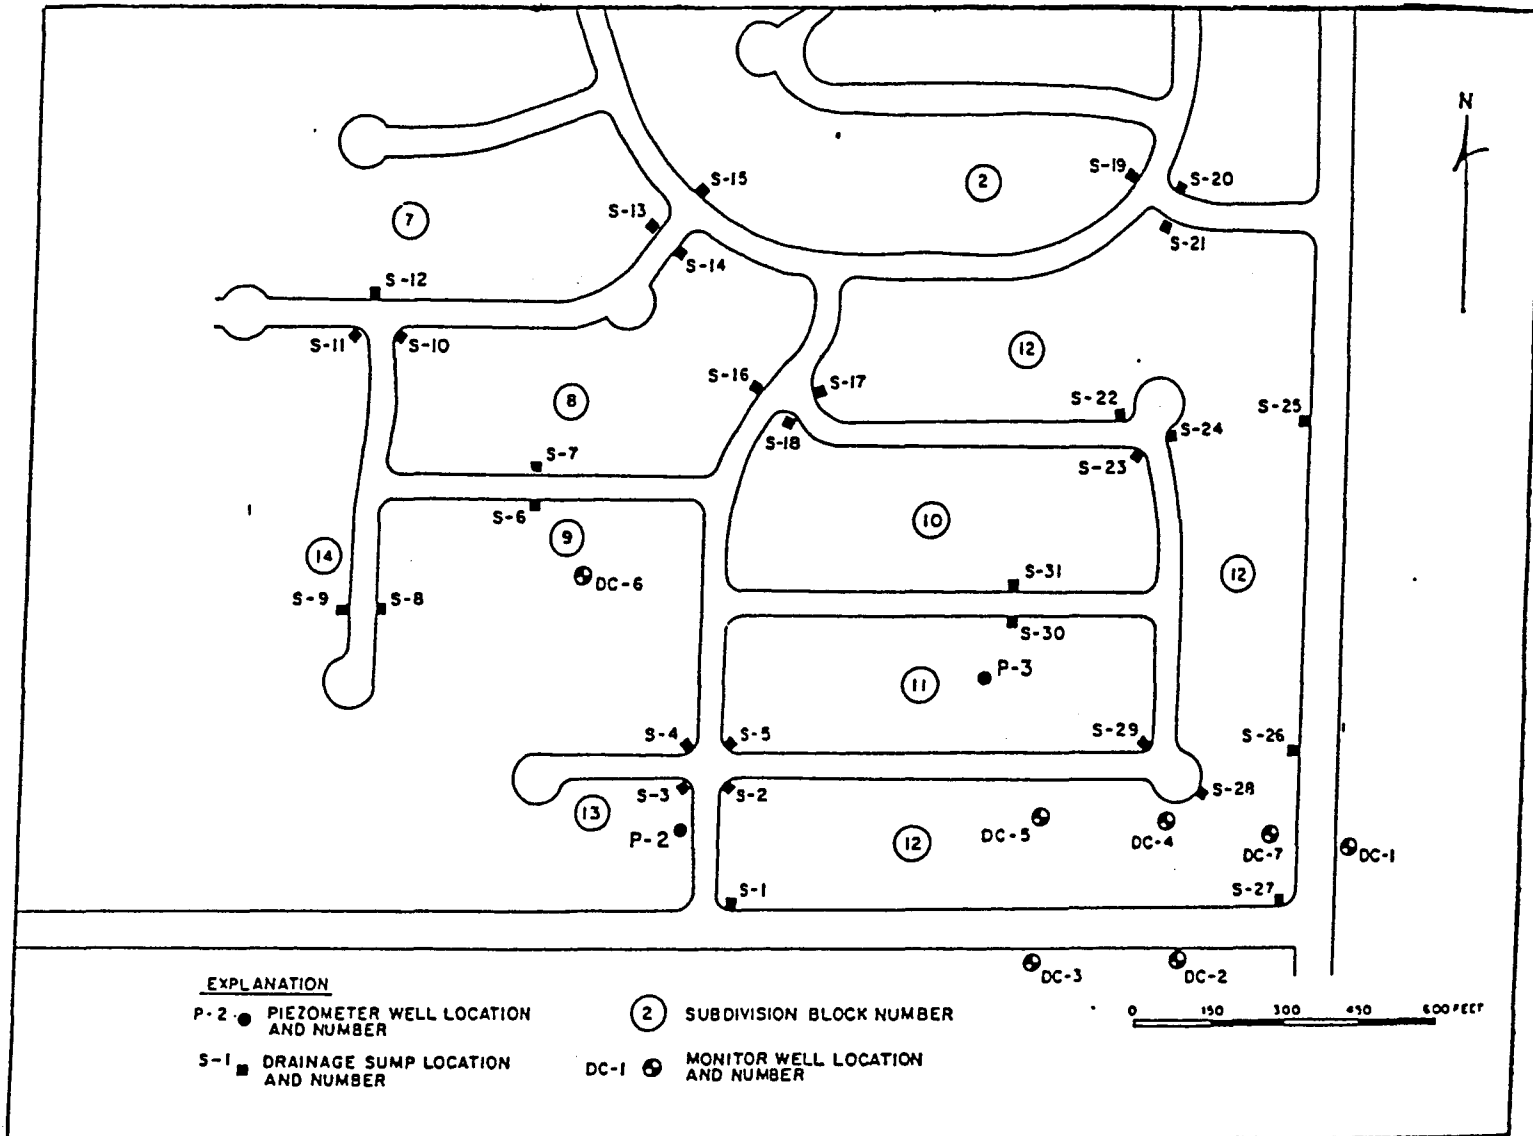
Locations of the drainage sumps, piezometer and monitoring wells in the subdivision site in Dade County, Florida.
